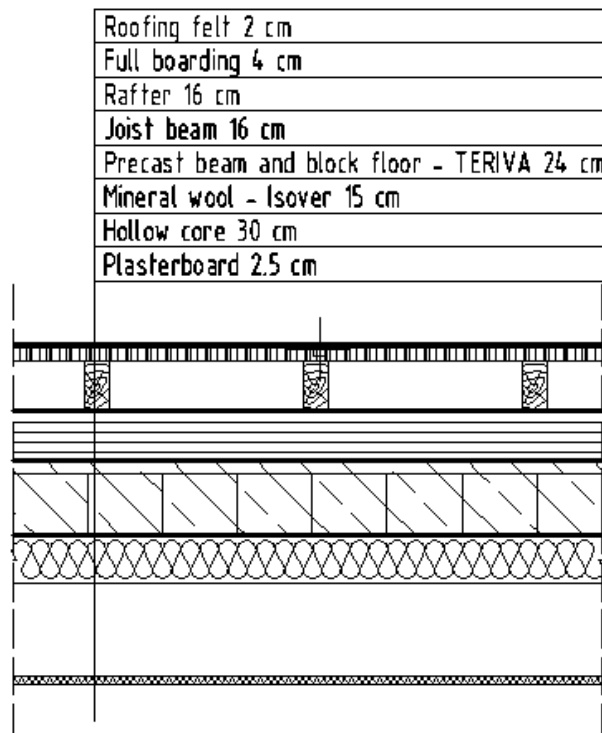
Structure of the roof cross section 1-1.
